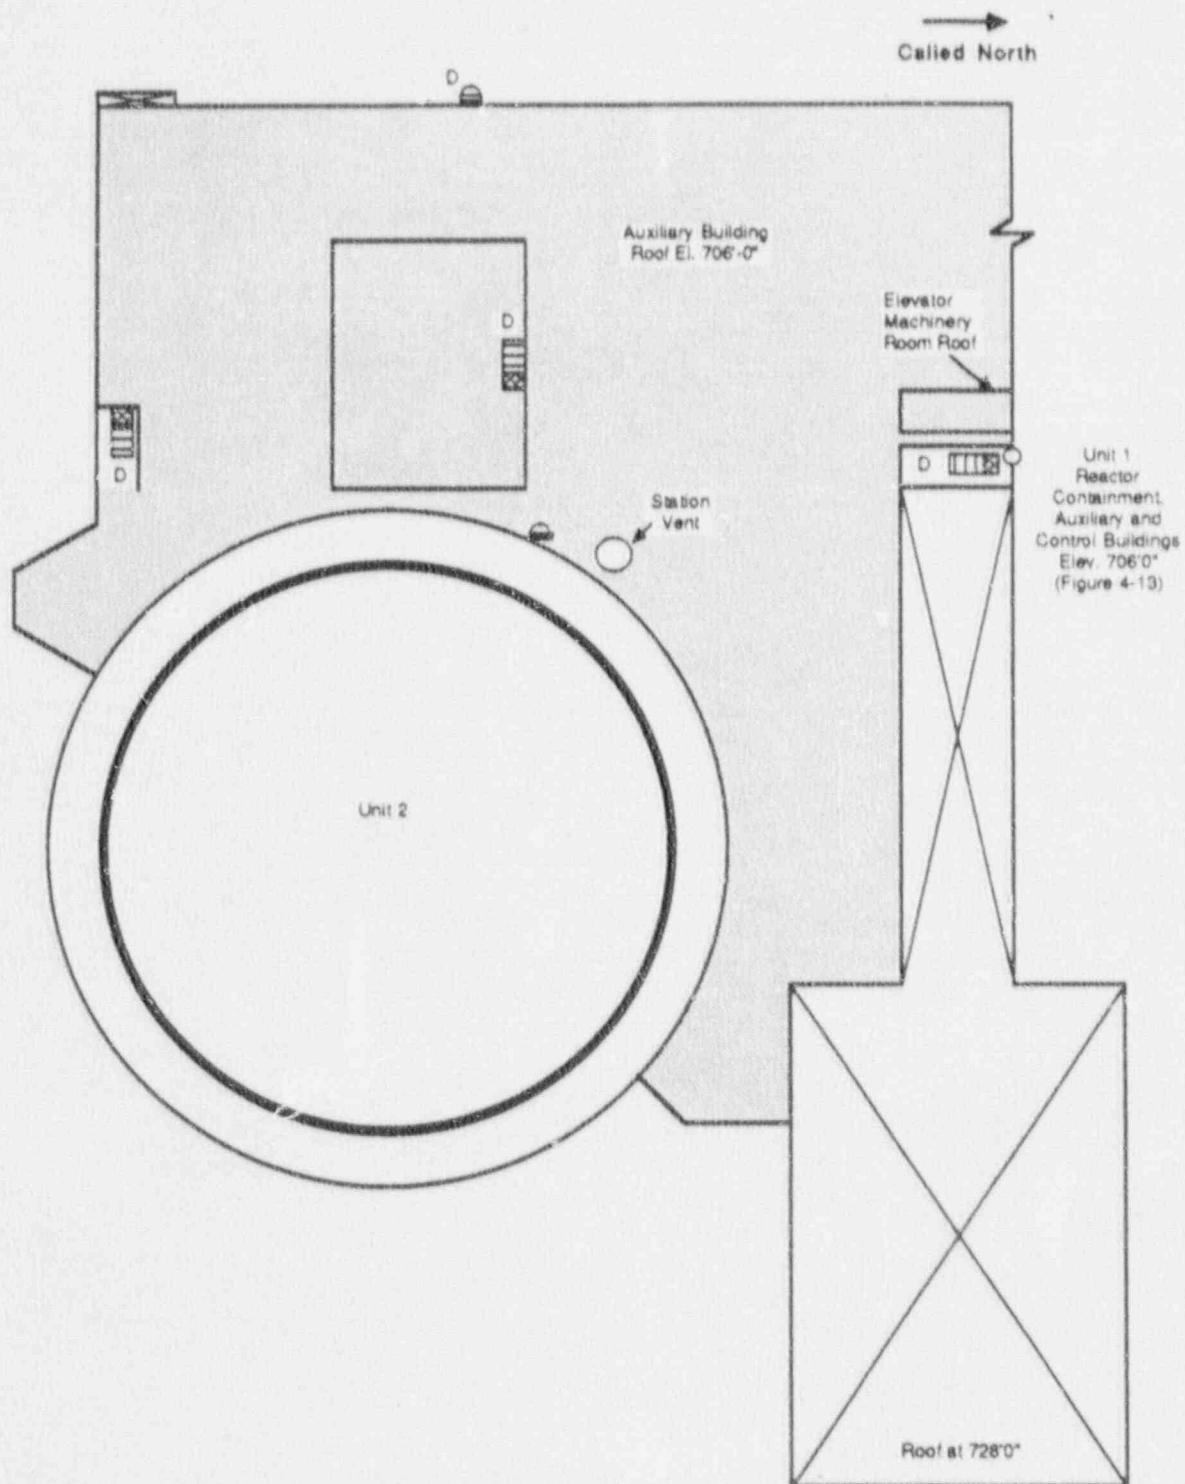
Bellefonte 2 Reactor Containment and Auxiliary Buildings, Elevation 706'-0"
